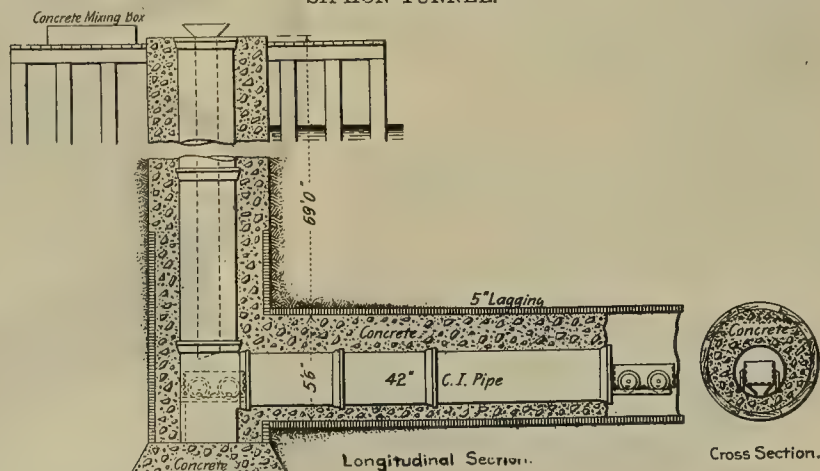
SECTION SHOWING METHOD OF CONCRETING CAST-IRON PIPE, CHARLESTOWN SIPHON TUNNEL.
